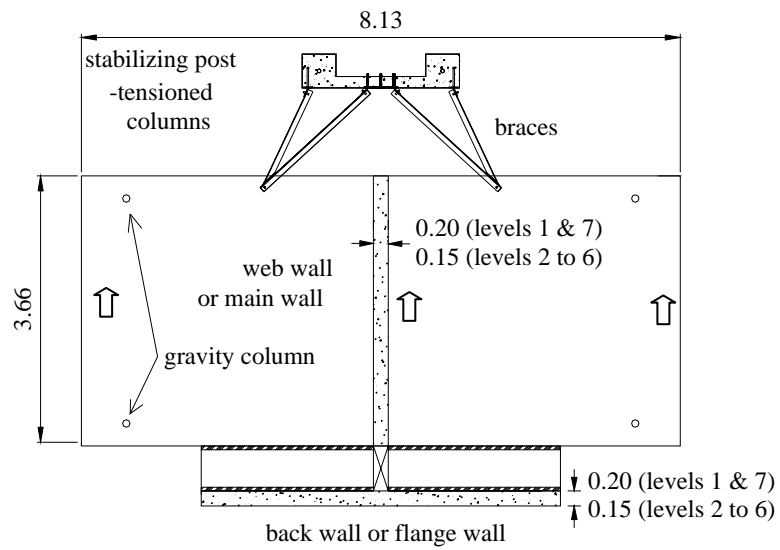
Plan view (unit: m) of the shear wall building slice
